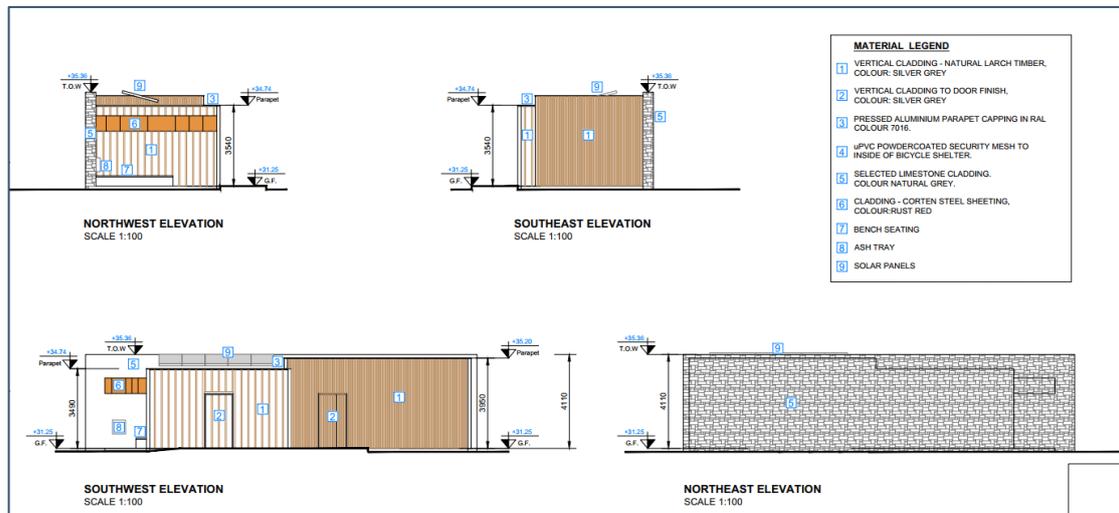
Extract of the elevations in Architectural Drawing No. 2412-QNA-XX-XX-DR-A-2040, submitted with the original application documentation, showing the proposed storage and bike shed. Not presented to scale.
